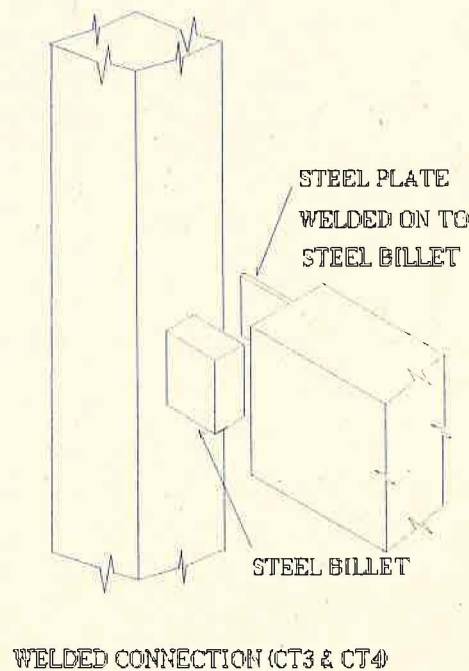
The Steel Billet-Welded Plate Precast Concrete Frame Connection used for the concerted study
